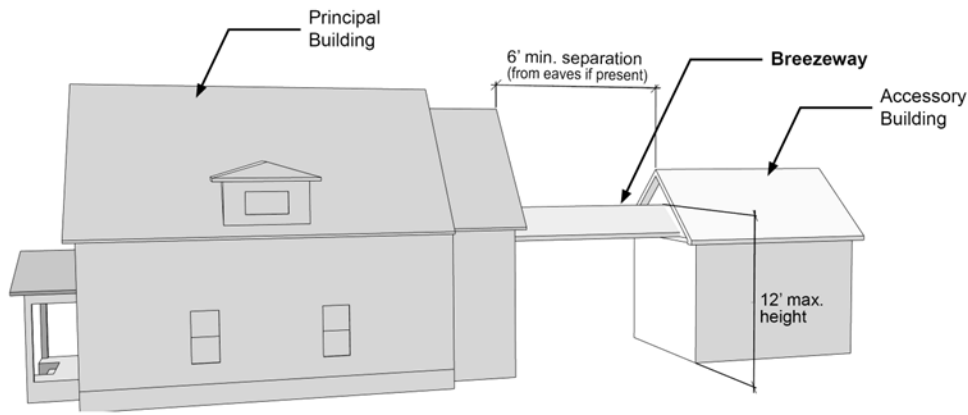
~~87~~: At-Grade Open or Enclosed Connection
